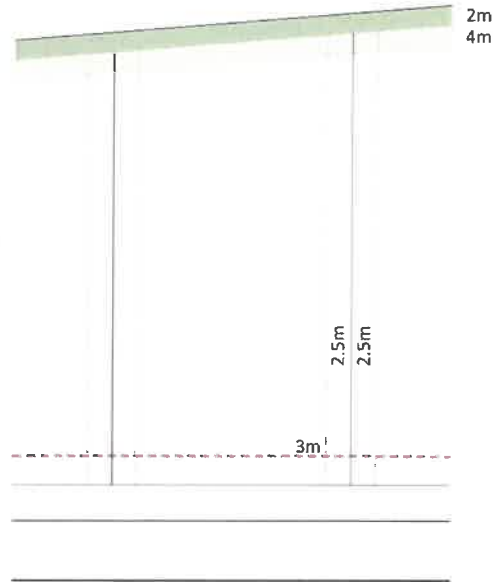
West Precinct Building Setbacks from Erf Boundaries
